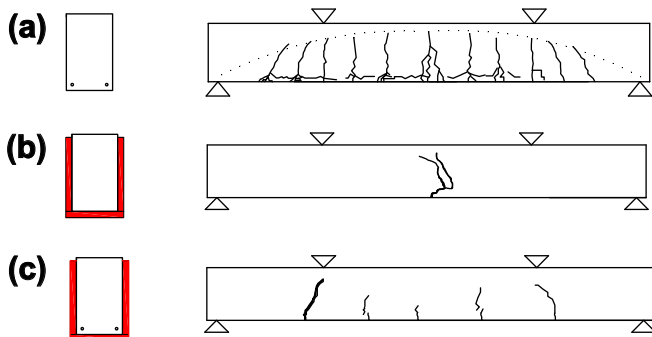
Crack pattern at failure: (a) RC beam without HPFRC jacket; (b) beam without steel reinforcement with HPFRC jacket; (c) RC beam with HPFRC jacket.
